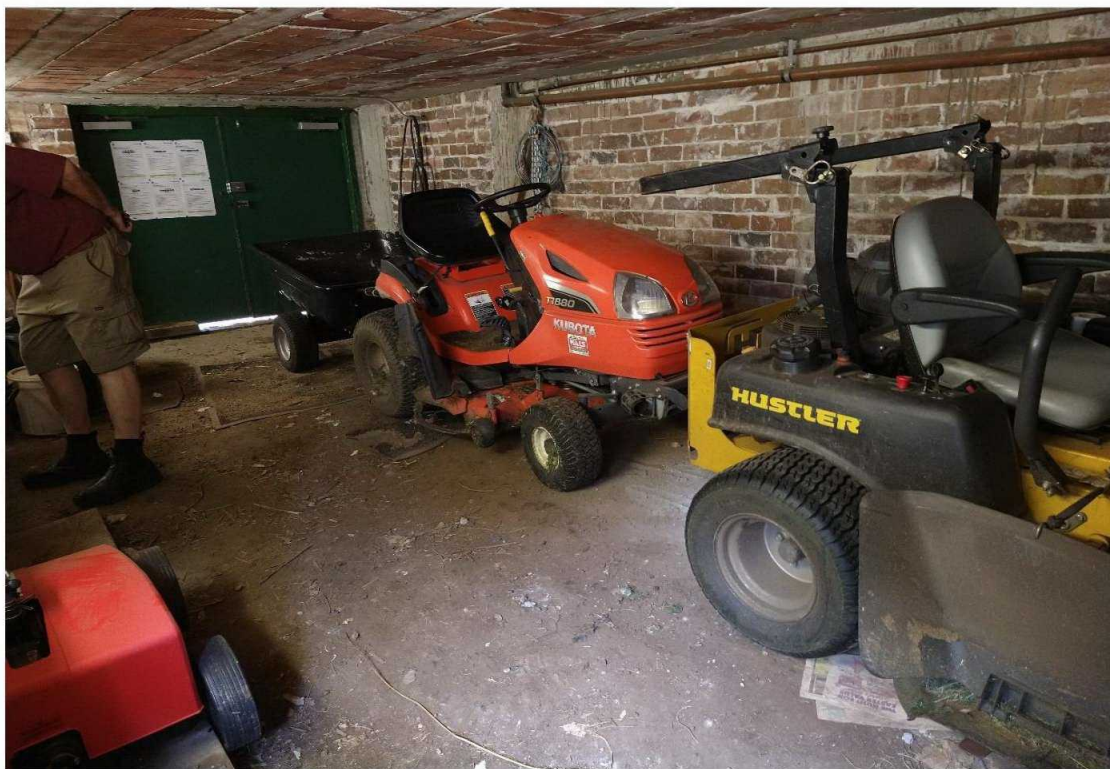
Loosely sealed pavement within groundskeeping storage alcove with lawnmowers
